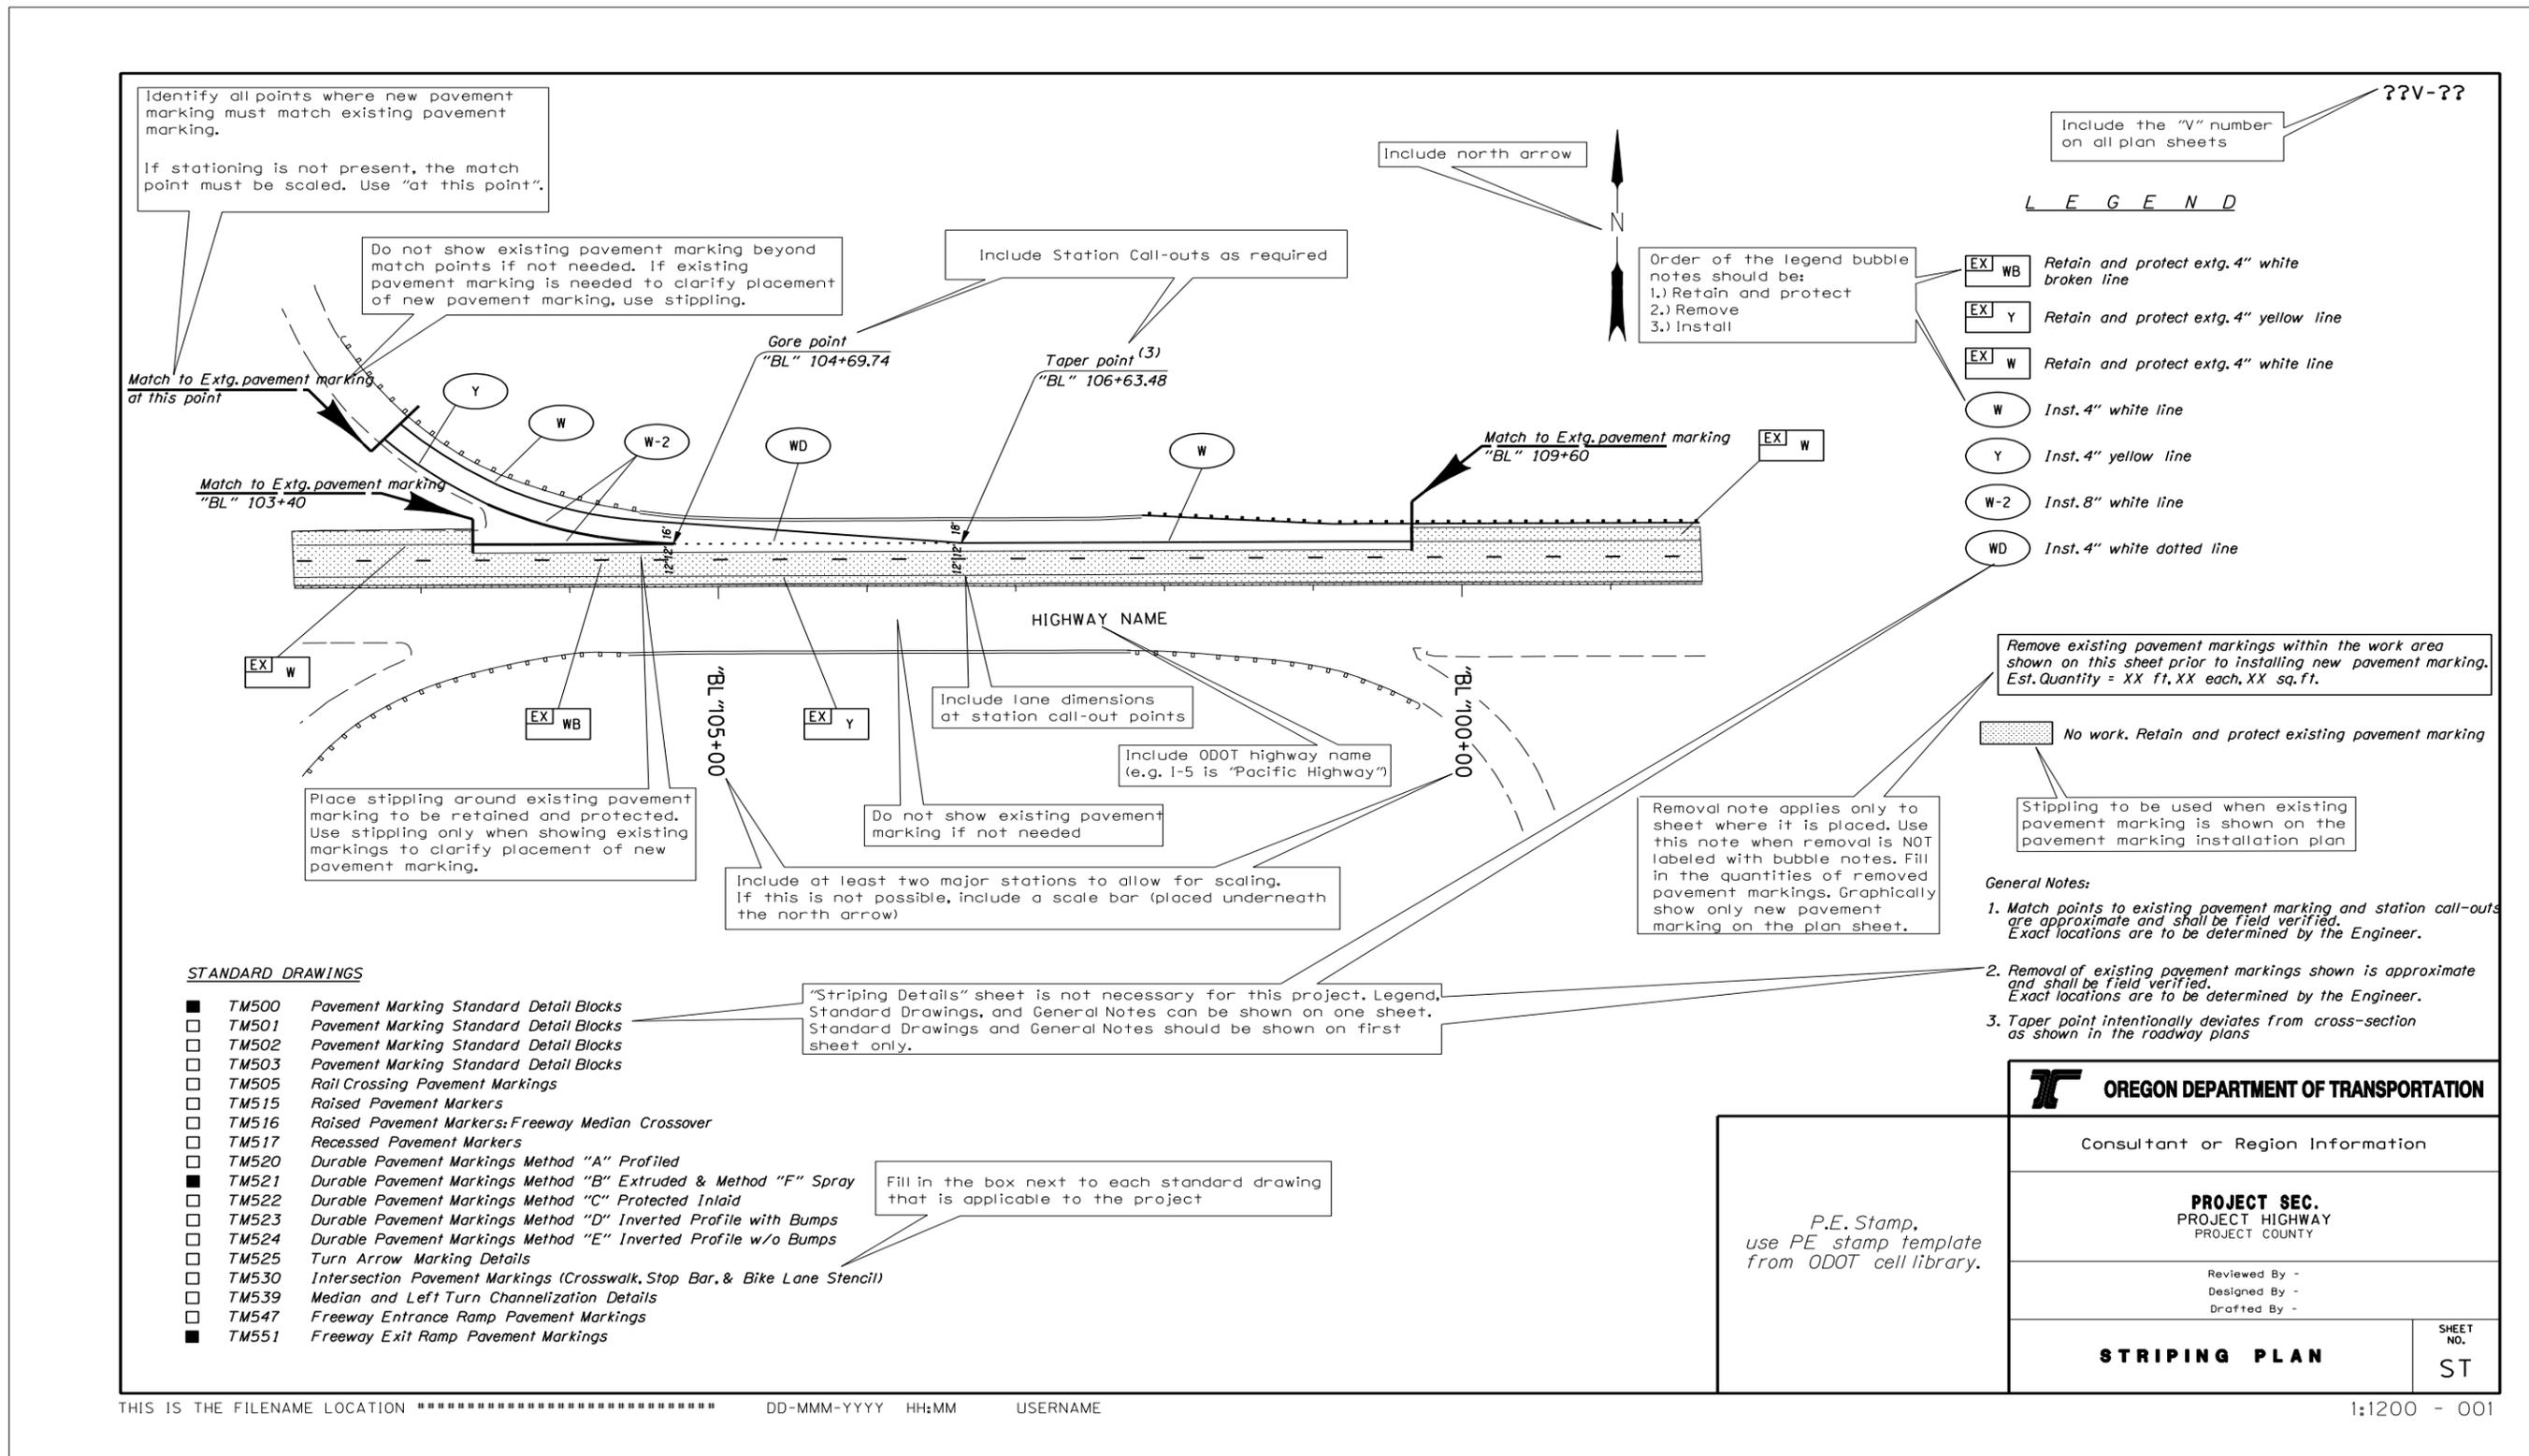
Striping Plan Sheet When a Striping Details Sheet is Not Used (1)
